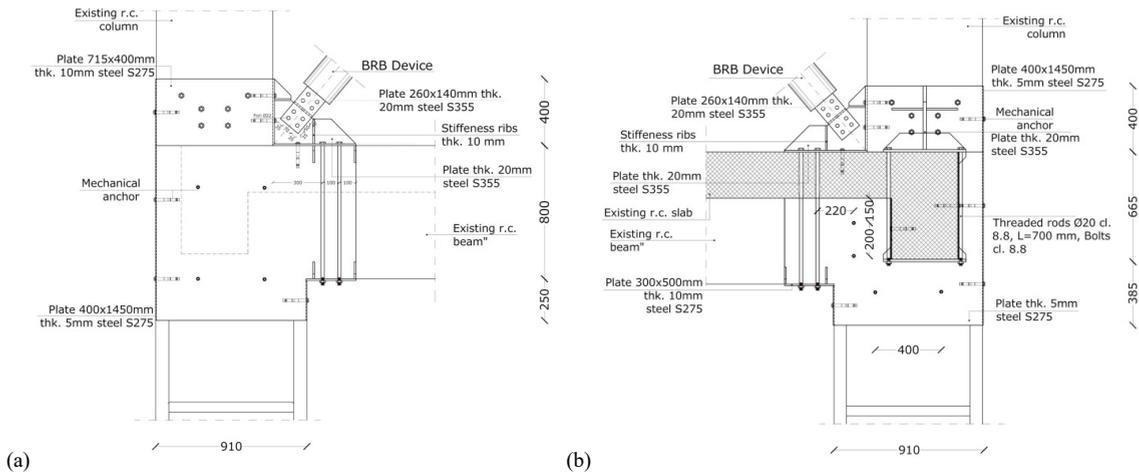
(a) Connection of damped brace to column: (a) Front view; (b) Section view.
